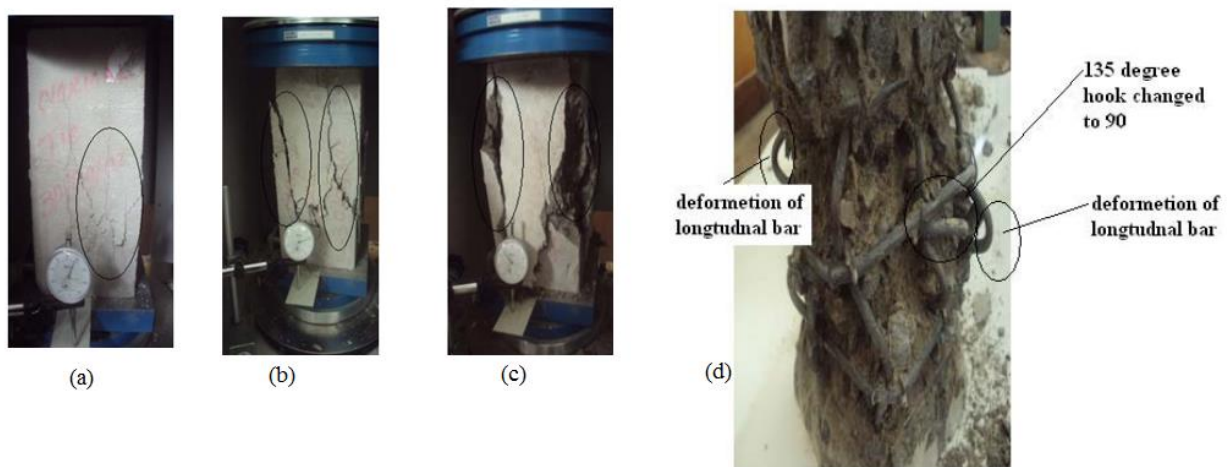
Failure Pattern of Specimen Confined by Transverse Reinforcement (Melat 2010)
